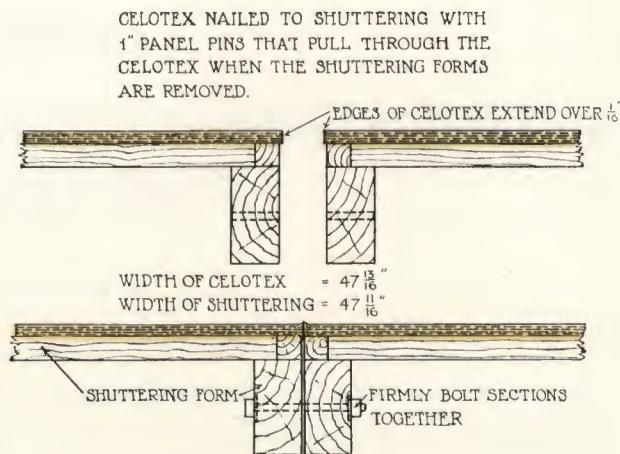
METHOD OF SEALING VERTICAL JOINTS WHEN CELOTEX IS USED FOR WALL CENTERING FORMS ARE IN SECTIONS $47\frac{13}{16}$ " WIDE BOLTED TOGETHER TO BE RE-USSED CELOTEX REMAINS BONDED TO CONCRETE
